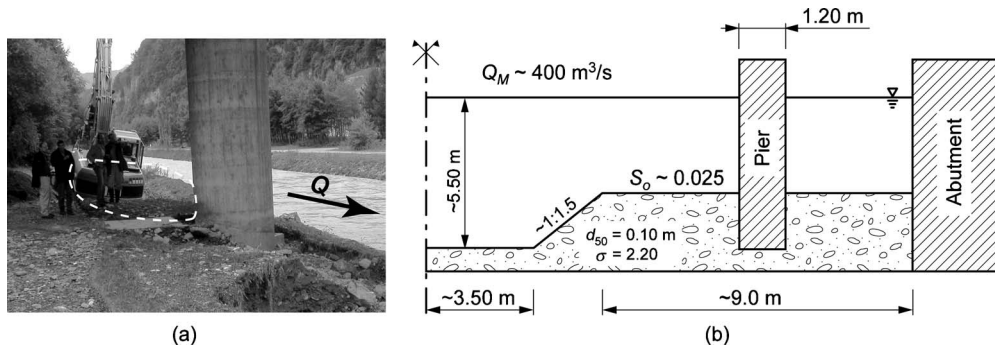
Highway bridge over River Linth (Switzerland) close to Filzbach (GL): (a) photo of bridge pier after flood event; (b) schematic flow section
